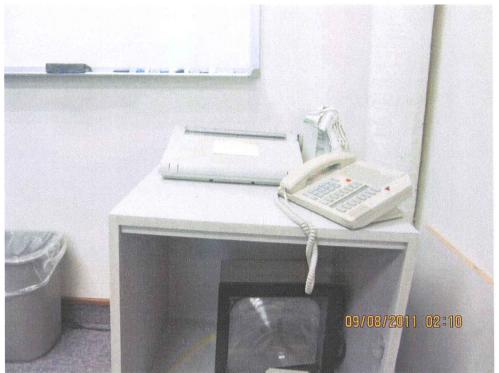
Leaning counter due to sloping floor in CCTV Room on west side of building.
